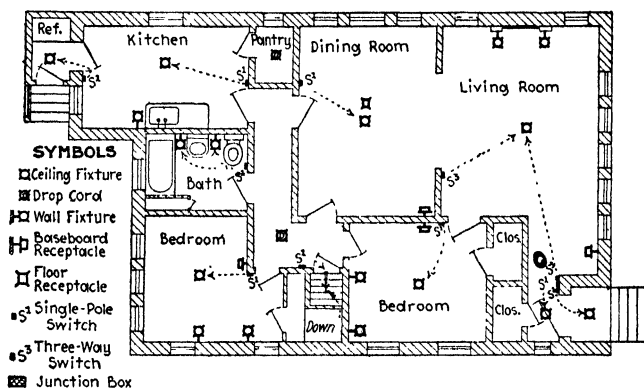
First-floor plan of a small residence showing (approximately) the locations of all electric outlets.
